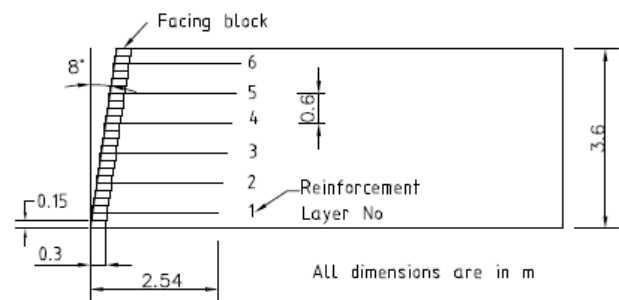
Schematic diagram of instrumented full-scale reinforced soil walls (Bathurst et al. 2009).
